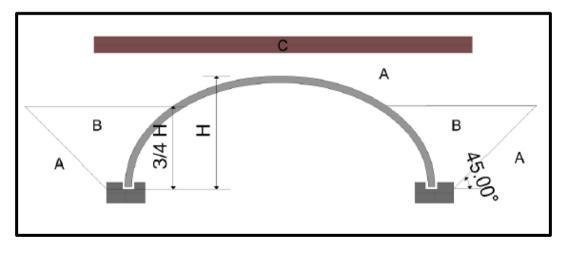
Critical Zones for Backfilling (BEBO Arch Systems Installation Guide, 2009)
